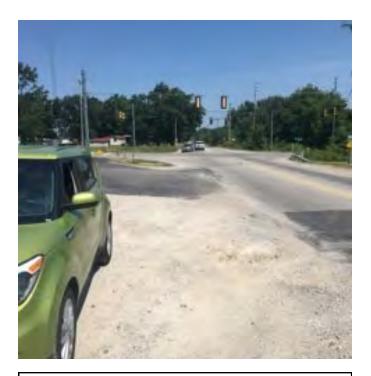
Facing south — view of CR 35 south of U.S. 20.
